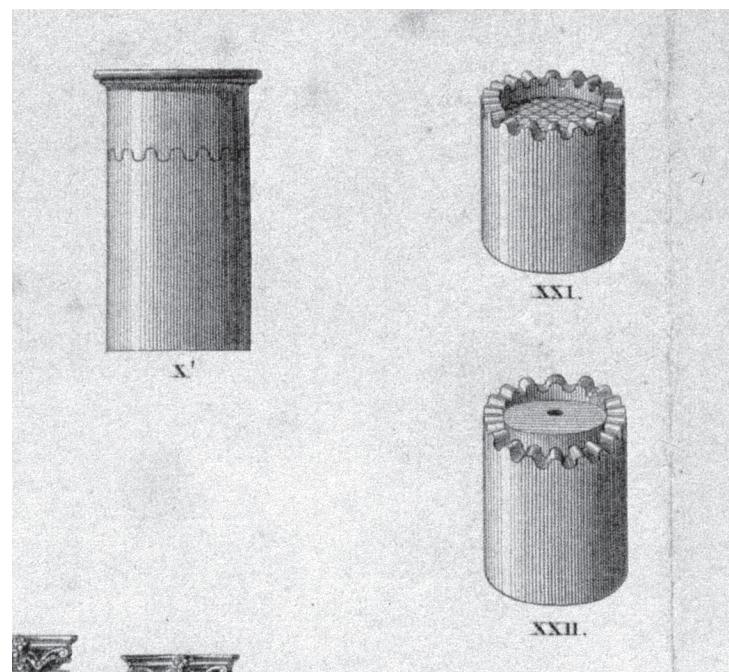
Jean Rondelet, *Traité de l'art de bâtir*, planche II, detail.
